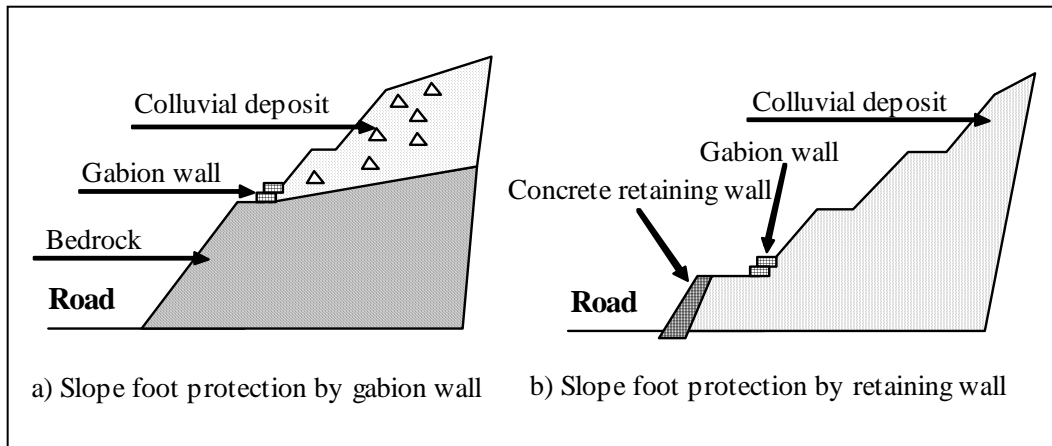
Schematic Diagram of Slope Foot Protection
